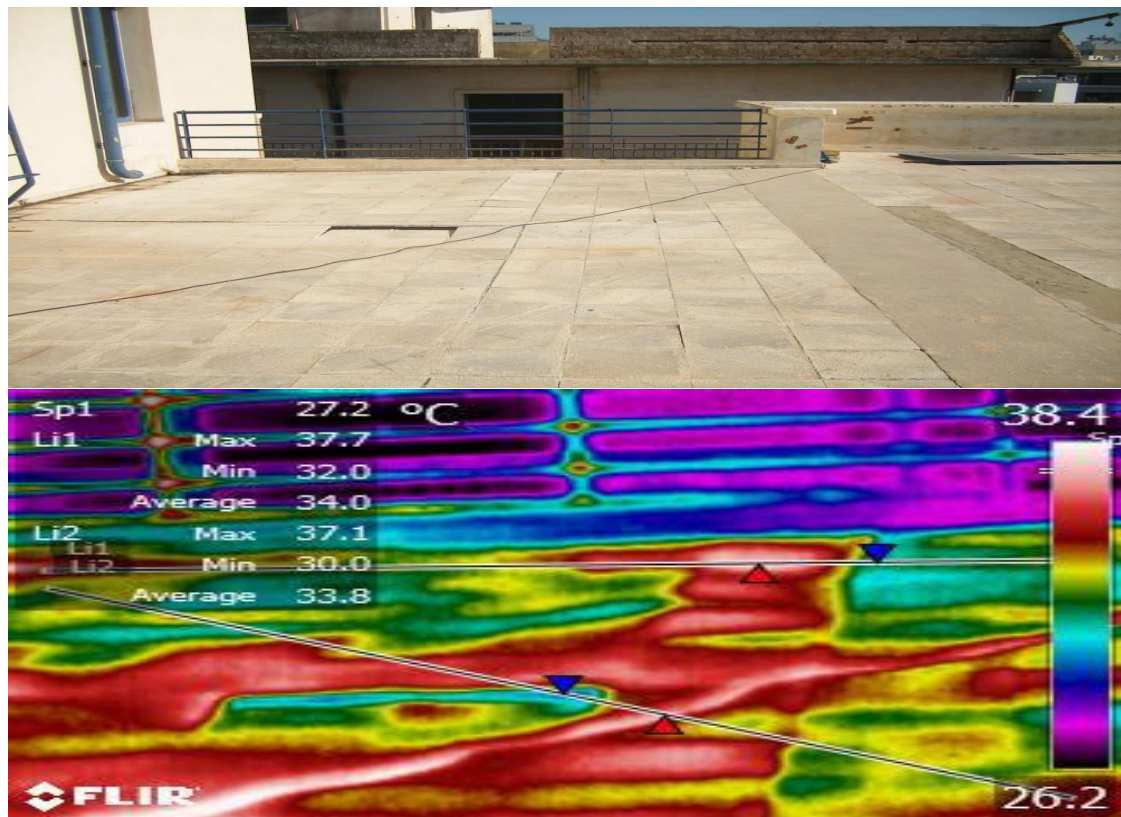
Thermal and visual photo of 3rd floor's roof tiles
